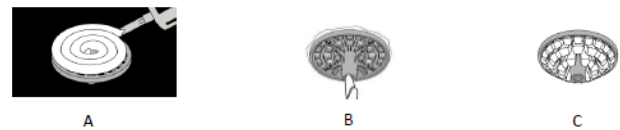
Mounting procedure for application of adhesive to anchor and attachment to concrete ceiling. A – application of adhesive to anchor; B – anchor pushed onto surface; C – correct appearance of extruded adhesive through holes of anchor.
